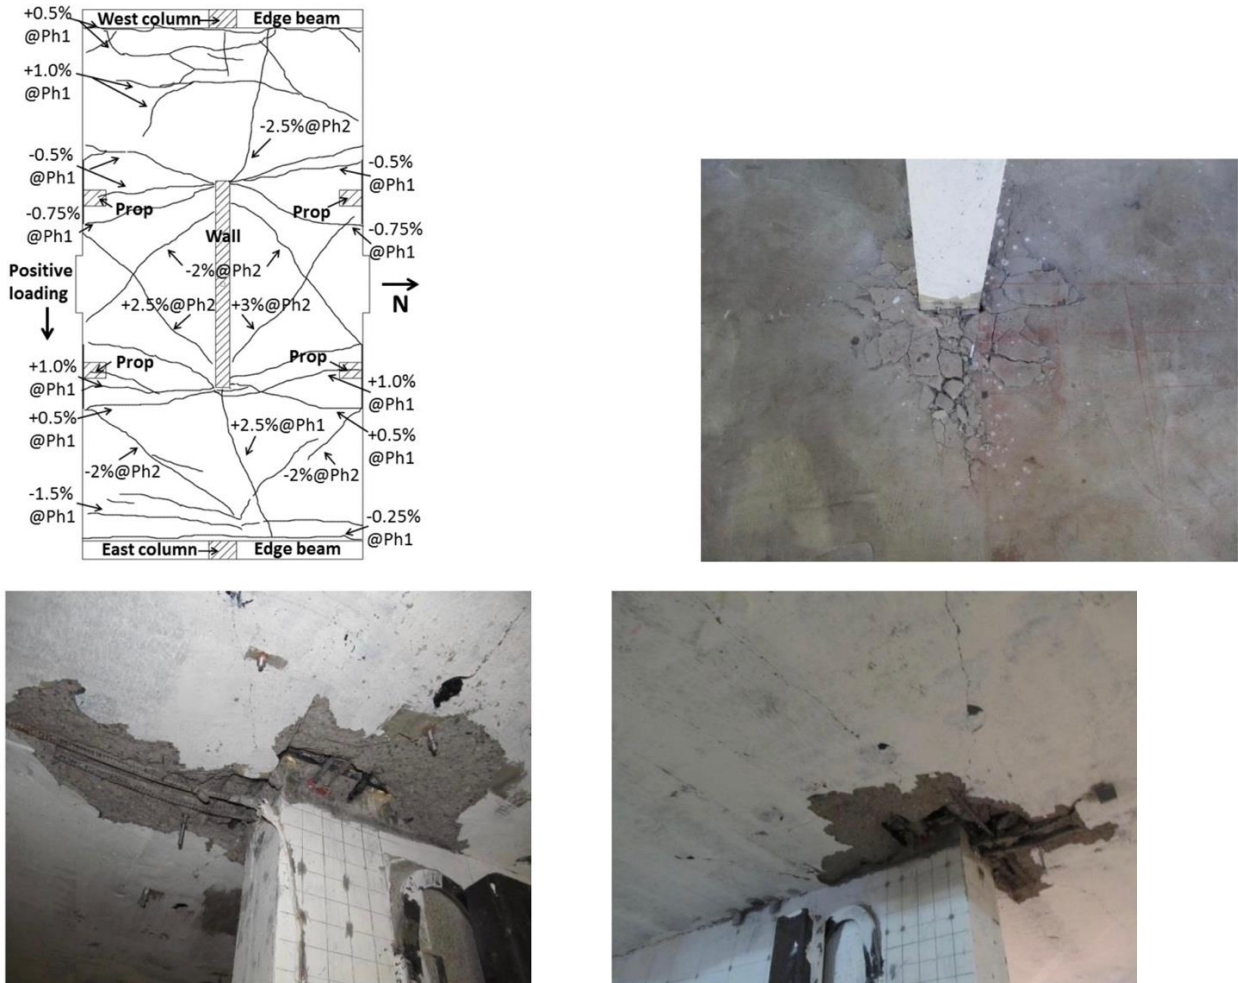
Crack map and localized damage at the wall-floor connection after the test (Specimen PFS1) (Liu 2016)
